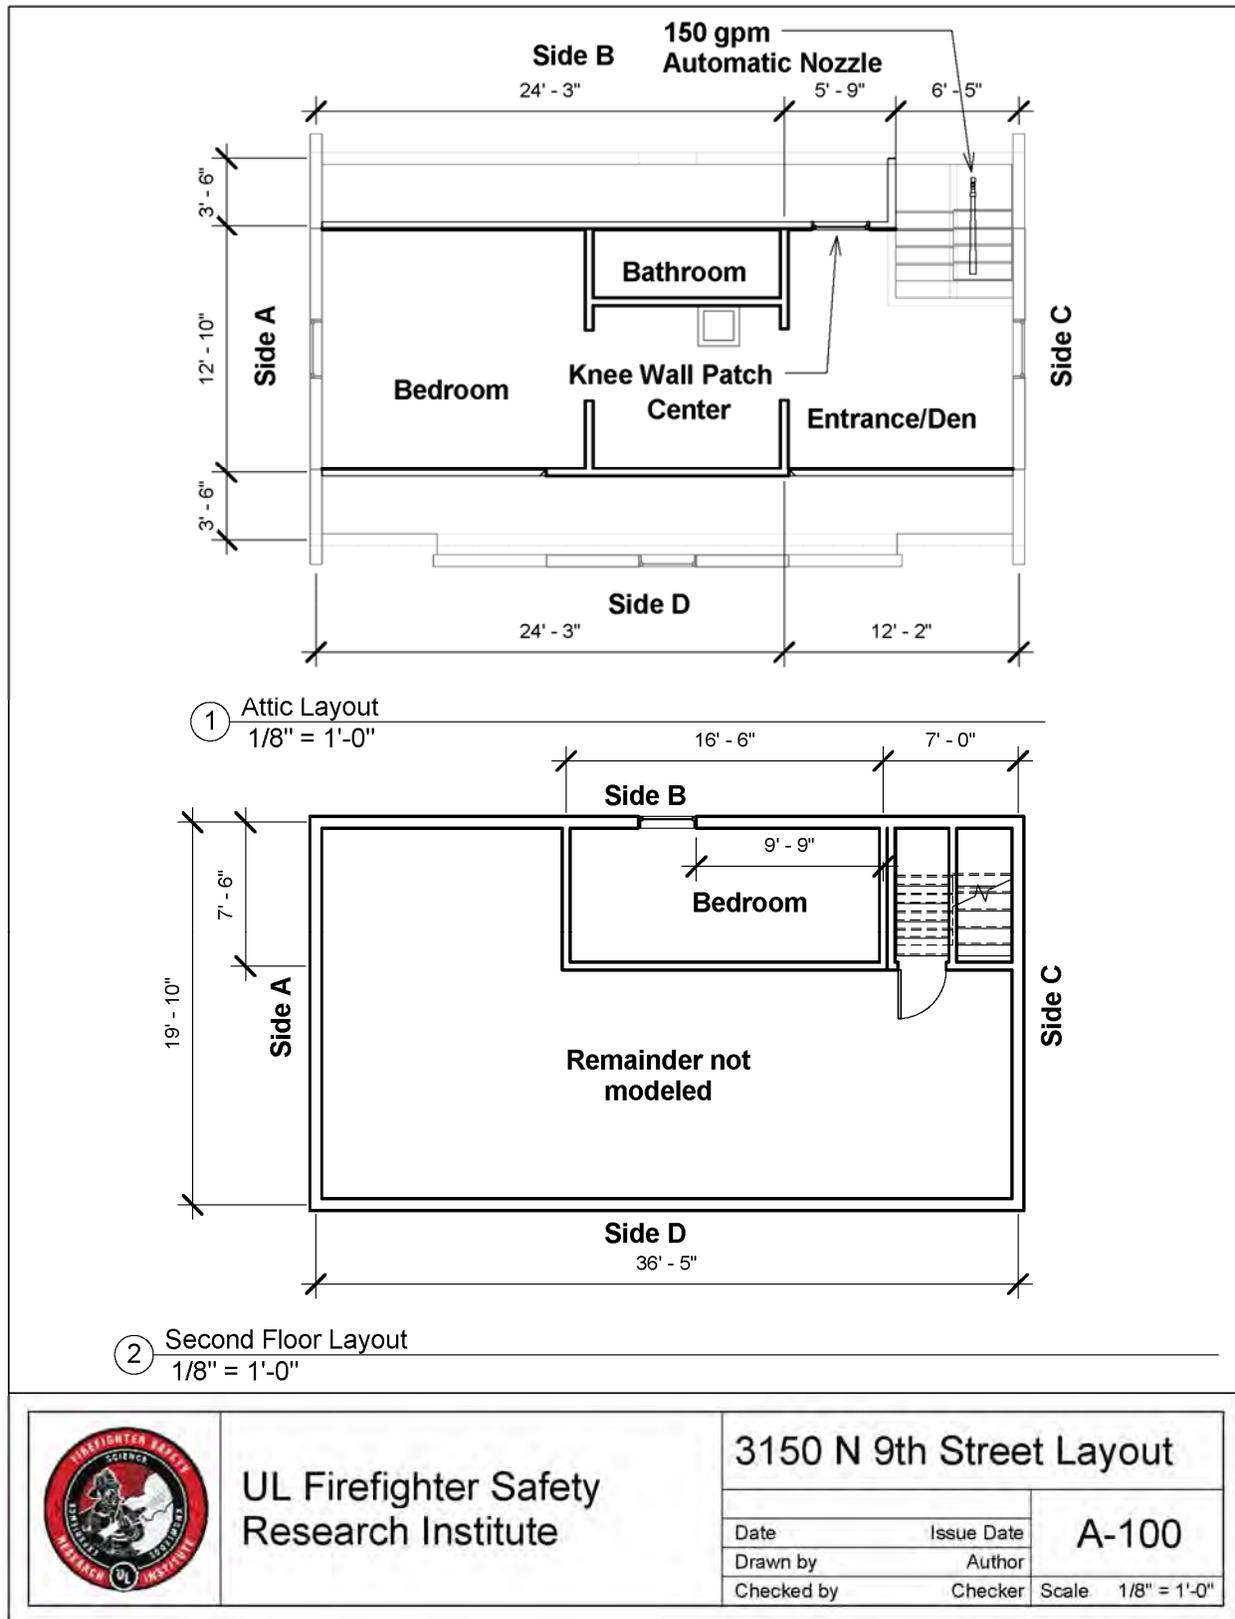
Experiment 1 – 3150 Nth 9th Street Layout Drawing
